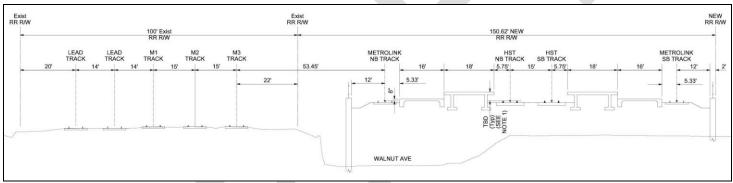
Typical Cross-Section – Fullerton Station – At-Grade HST Station Option
